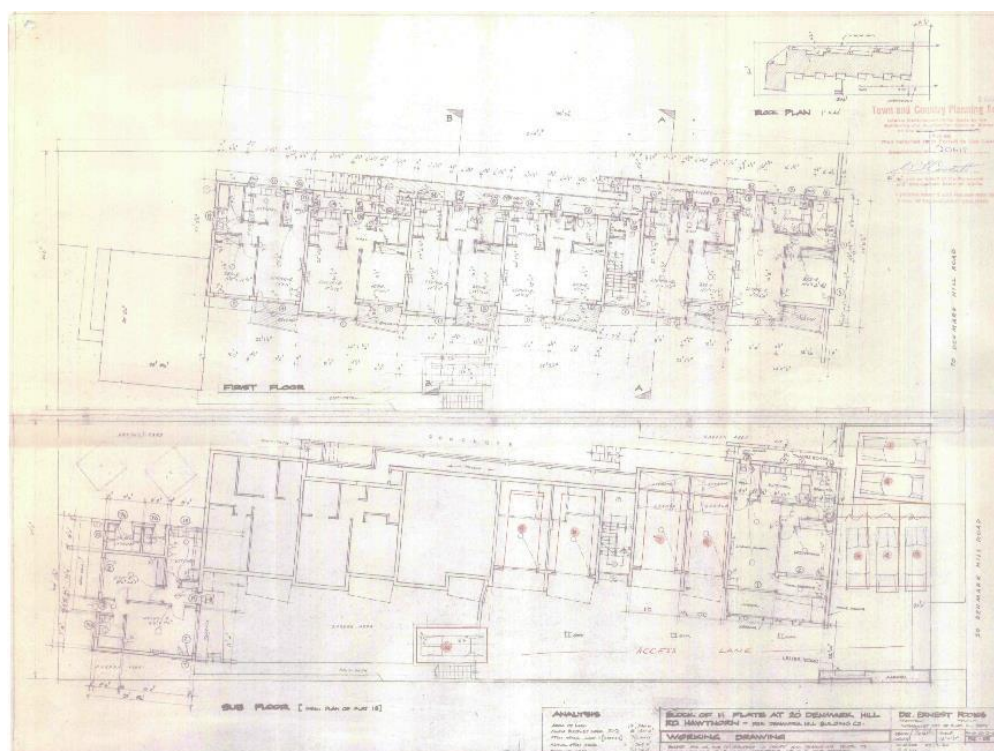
Architectural drawings for 20 Denmark Hill Road, Hawthorn East by Dr Ernest Fooks, 1960. (Source: Building Permit 20618)
